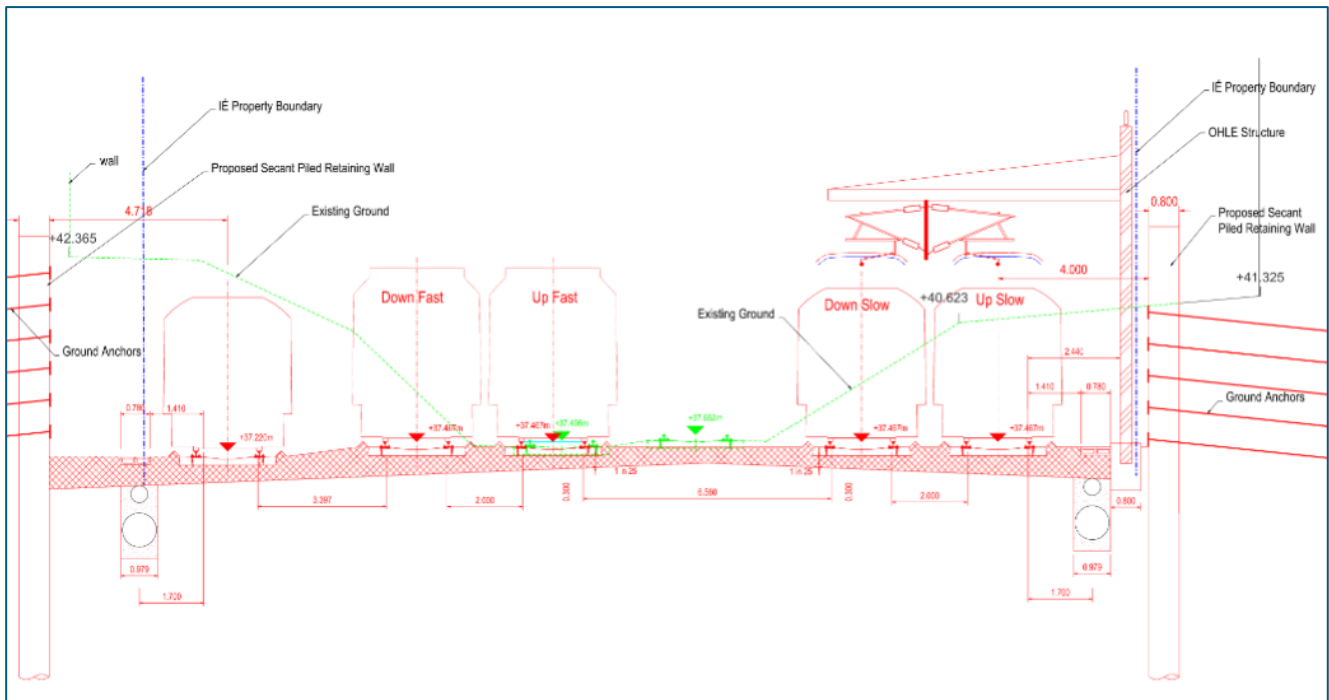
Cross Section looking West at CH 12+030, 30m East of Kylemore Road Bridge (OBC5A) – Facing West
